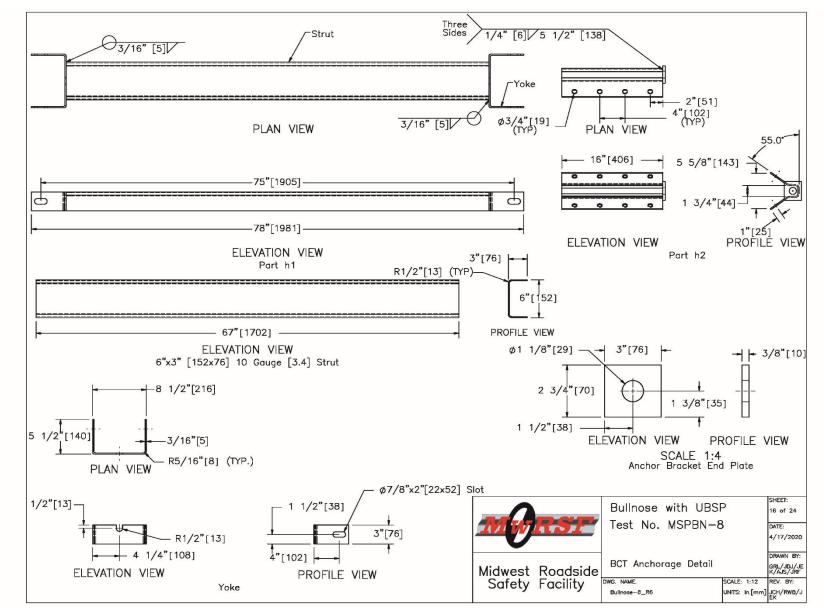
BCT Anchorage Detail, Test No. MSPBN-8
